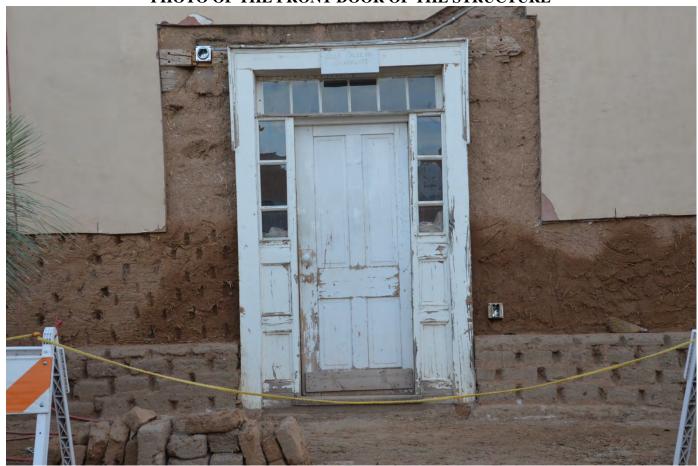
PHOTO OF THE FRONT DOOR OF THE STRUCTURE
